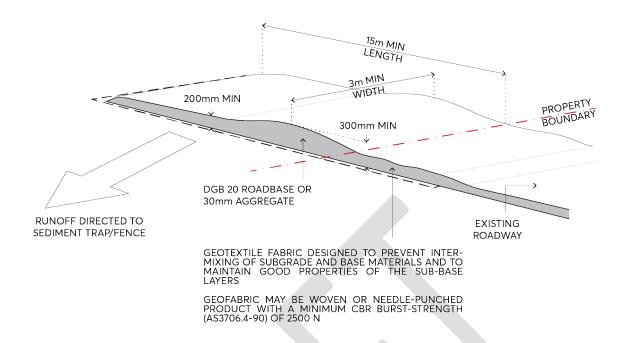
Stabilised Site Access (Source: Soils and Construction: Managing Urban Stormwater, Landcom, March 2004)
